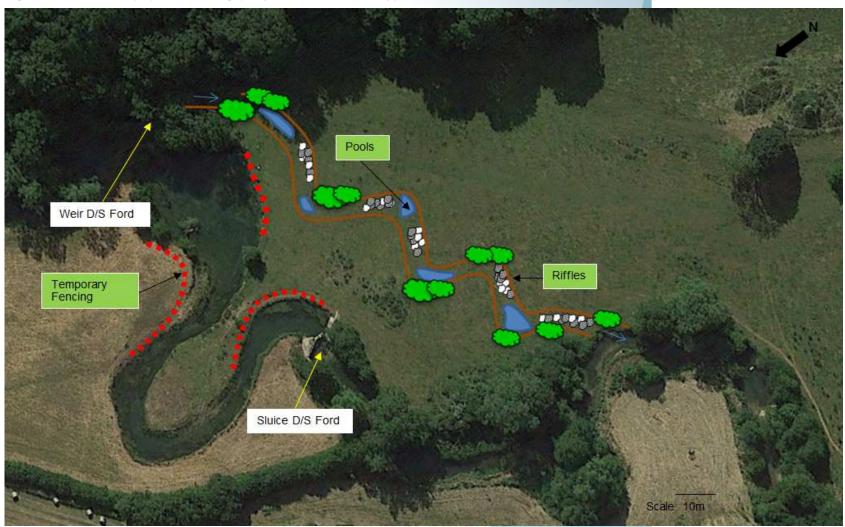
Schematic Diagram Illustrating a Bypass Channel Construction Arrangement
